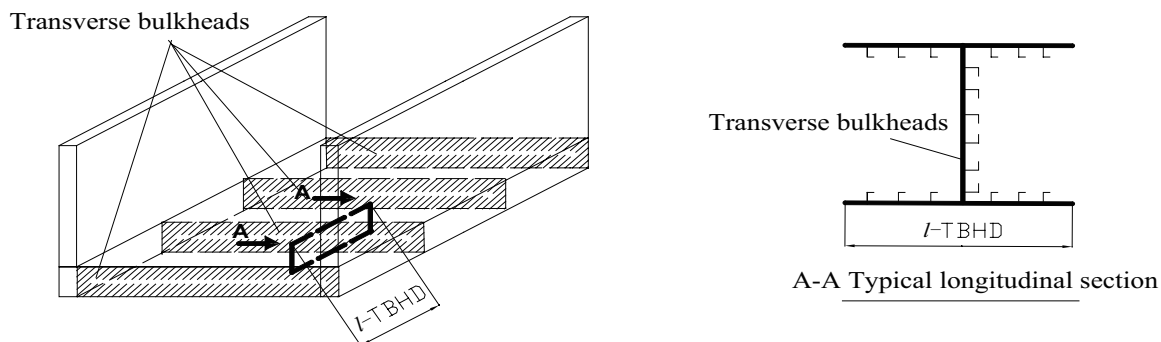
Typical mode of cross-section loading of floating dock
